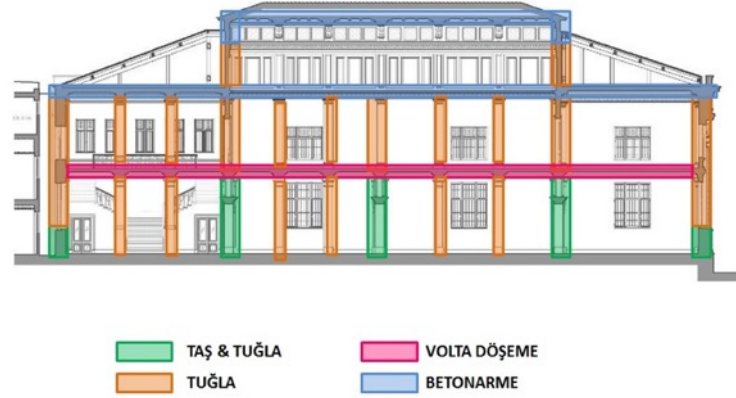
The main construction techniques of 3<sup>rd</sup> phase of IAM; green color stone and brick; orange color symbolizes brick; pink color symbolizes jack arched flooring; blue color symbolizes reinforced concrete (drawn by Rabia Şentürk on behalf of *Güryapı İnşaat Taah. ve Tic. A.Ş.*) (Source: IDSM Archive)
